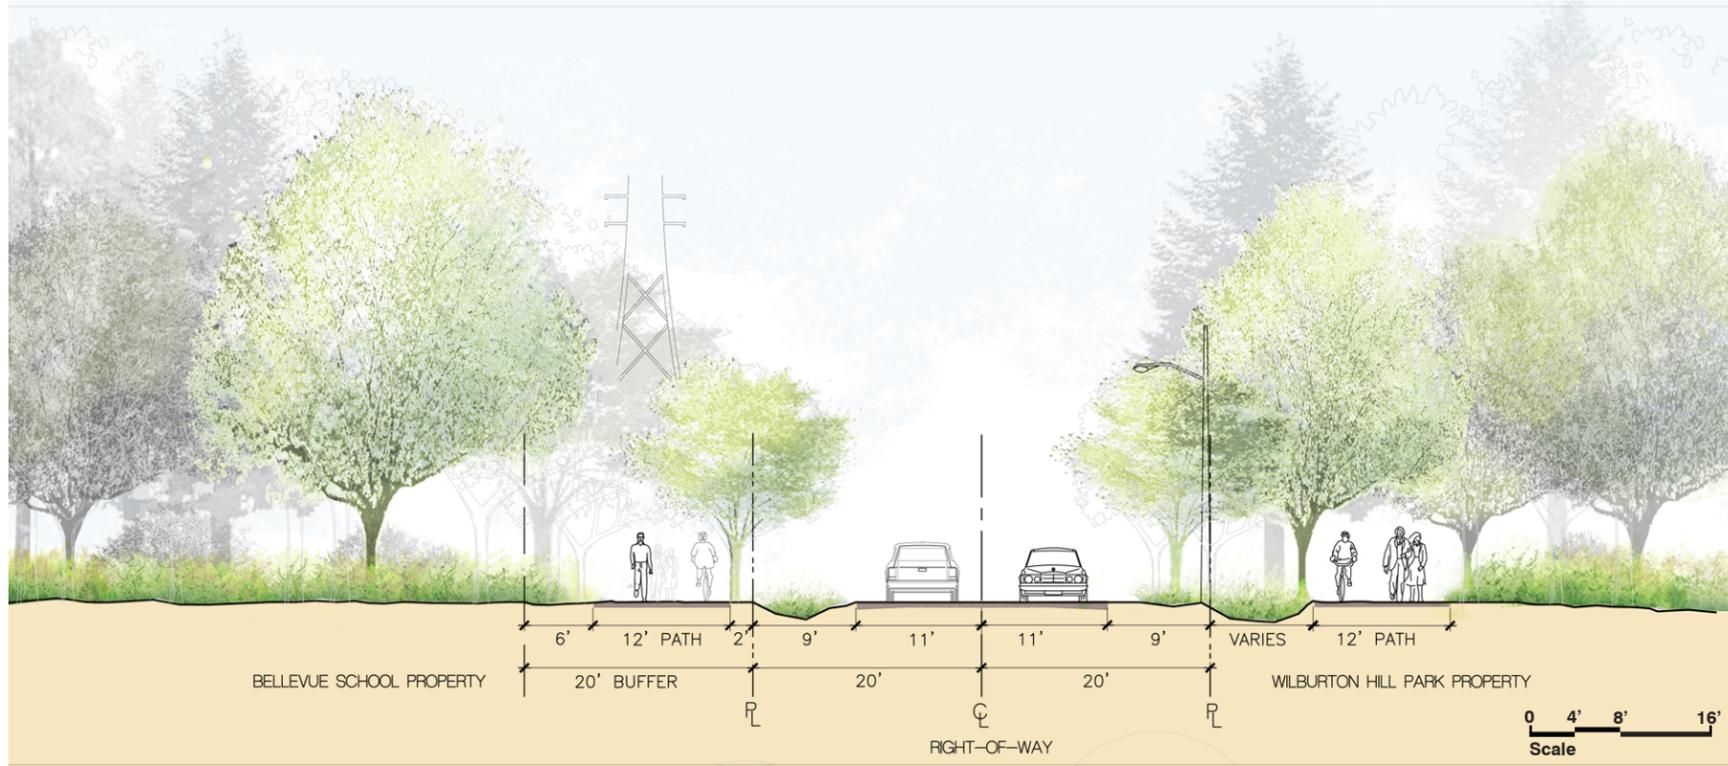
124th Avenue NE Concept Section (Looking North)
